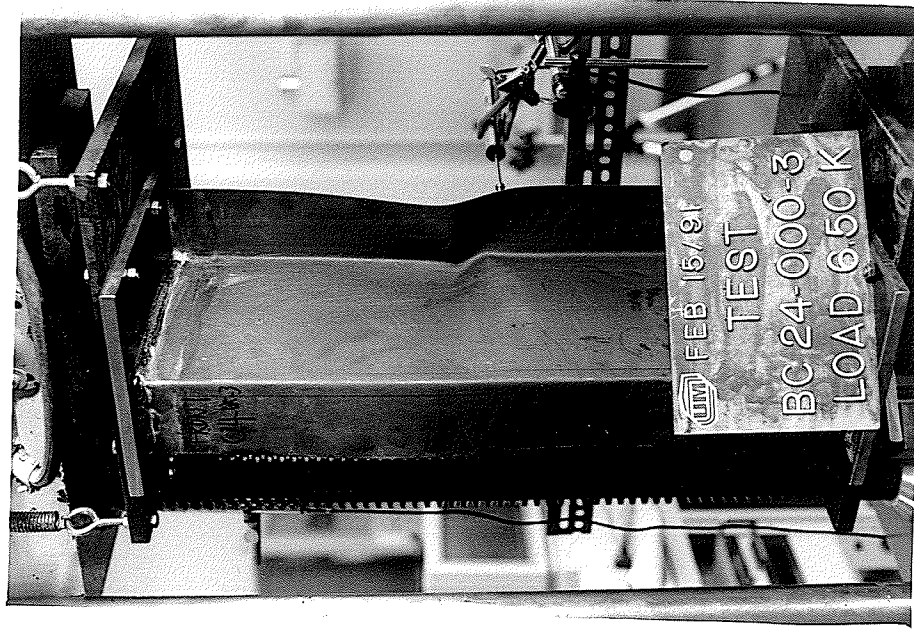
Typical Post-Test Z-Section Beam Specimens with and without Edge Stiffeners
